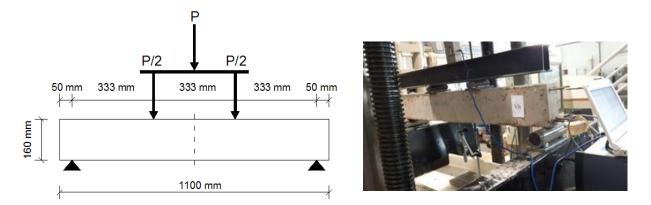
Test set-up. a) Four-point bending set-up (schematic drawing); b) General view of the test setup and instrumentation.
